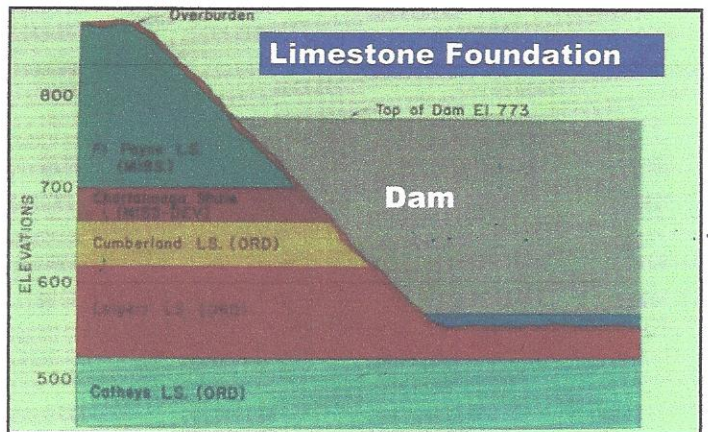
Summary of site geology. View of the site stratigraphy at the left abutment / concrete dam interface, looking downstream (Source: USACE)
